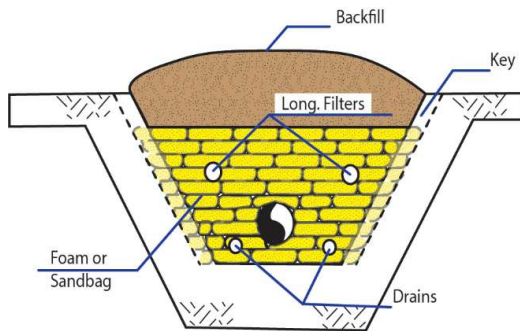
TYPICAL TRENCH CROSS SECTION WITH PIPELINE AND TRENCH BREAKER INSTALLATION. KEYS ON THE TRENCH'S WALL HELP TO LOCK THE TRENCH BREAKER.
